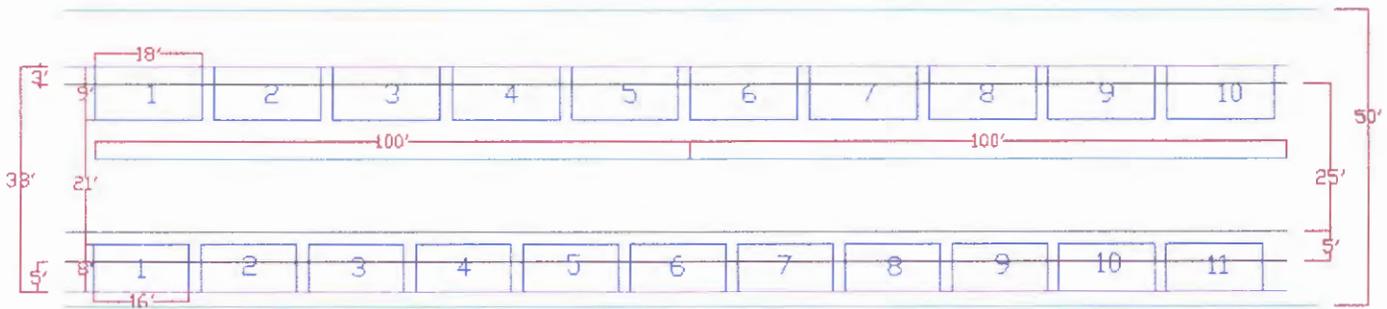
CONCEPTUAL PARKING DESIGN ALONG CAVE LANDING ROAD
